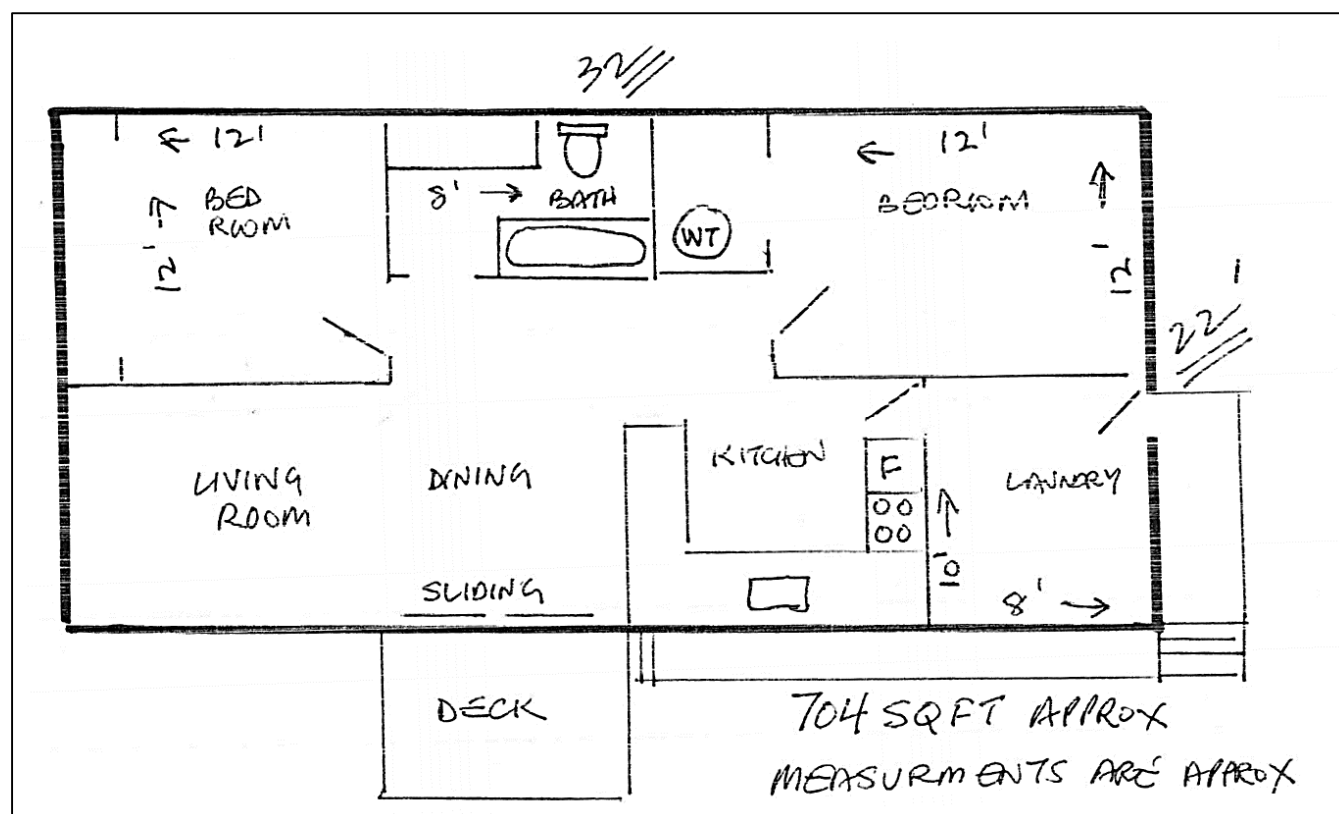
Rough sketch of dwelling layout – not to scale (provided by applicant)
